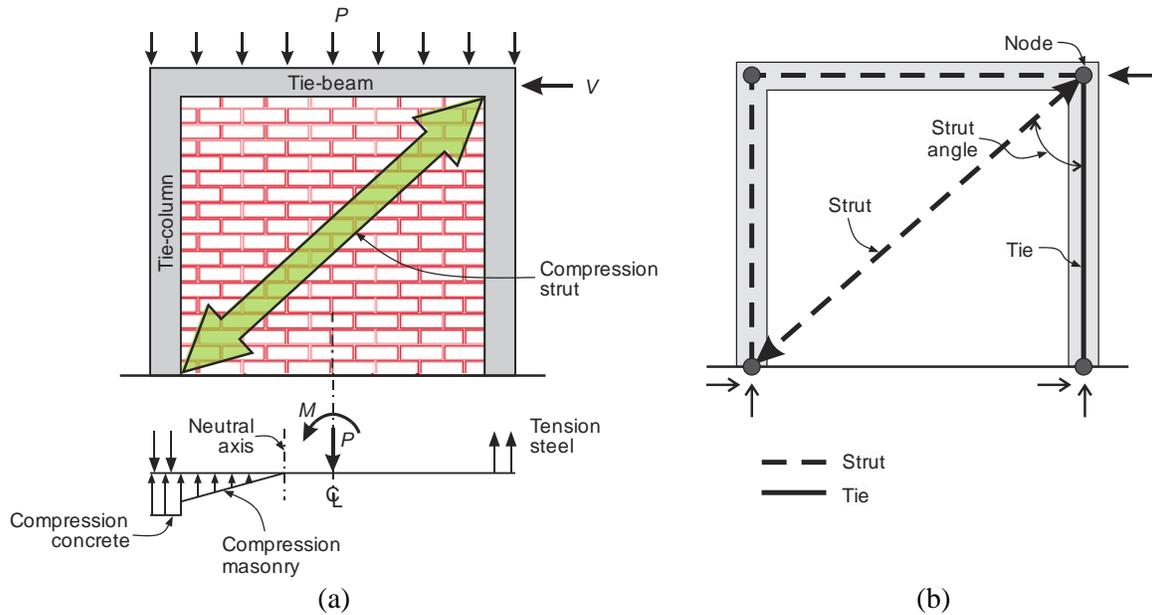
(a) Internal force distribution in a confined masonry wall panel subjected to combined axial load and bending (redrawn from Meli et al. [23]), and (b) a possible strut-and-tie model for confined masonry wall
